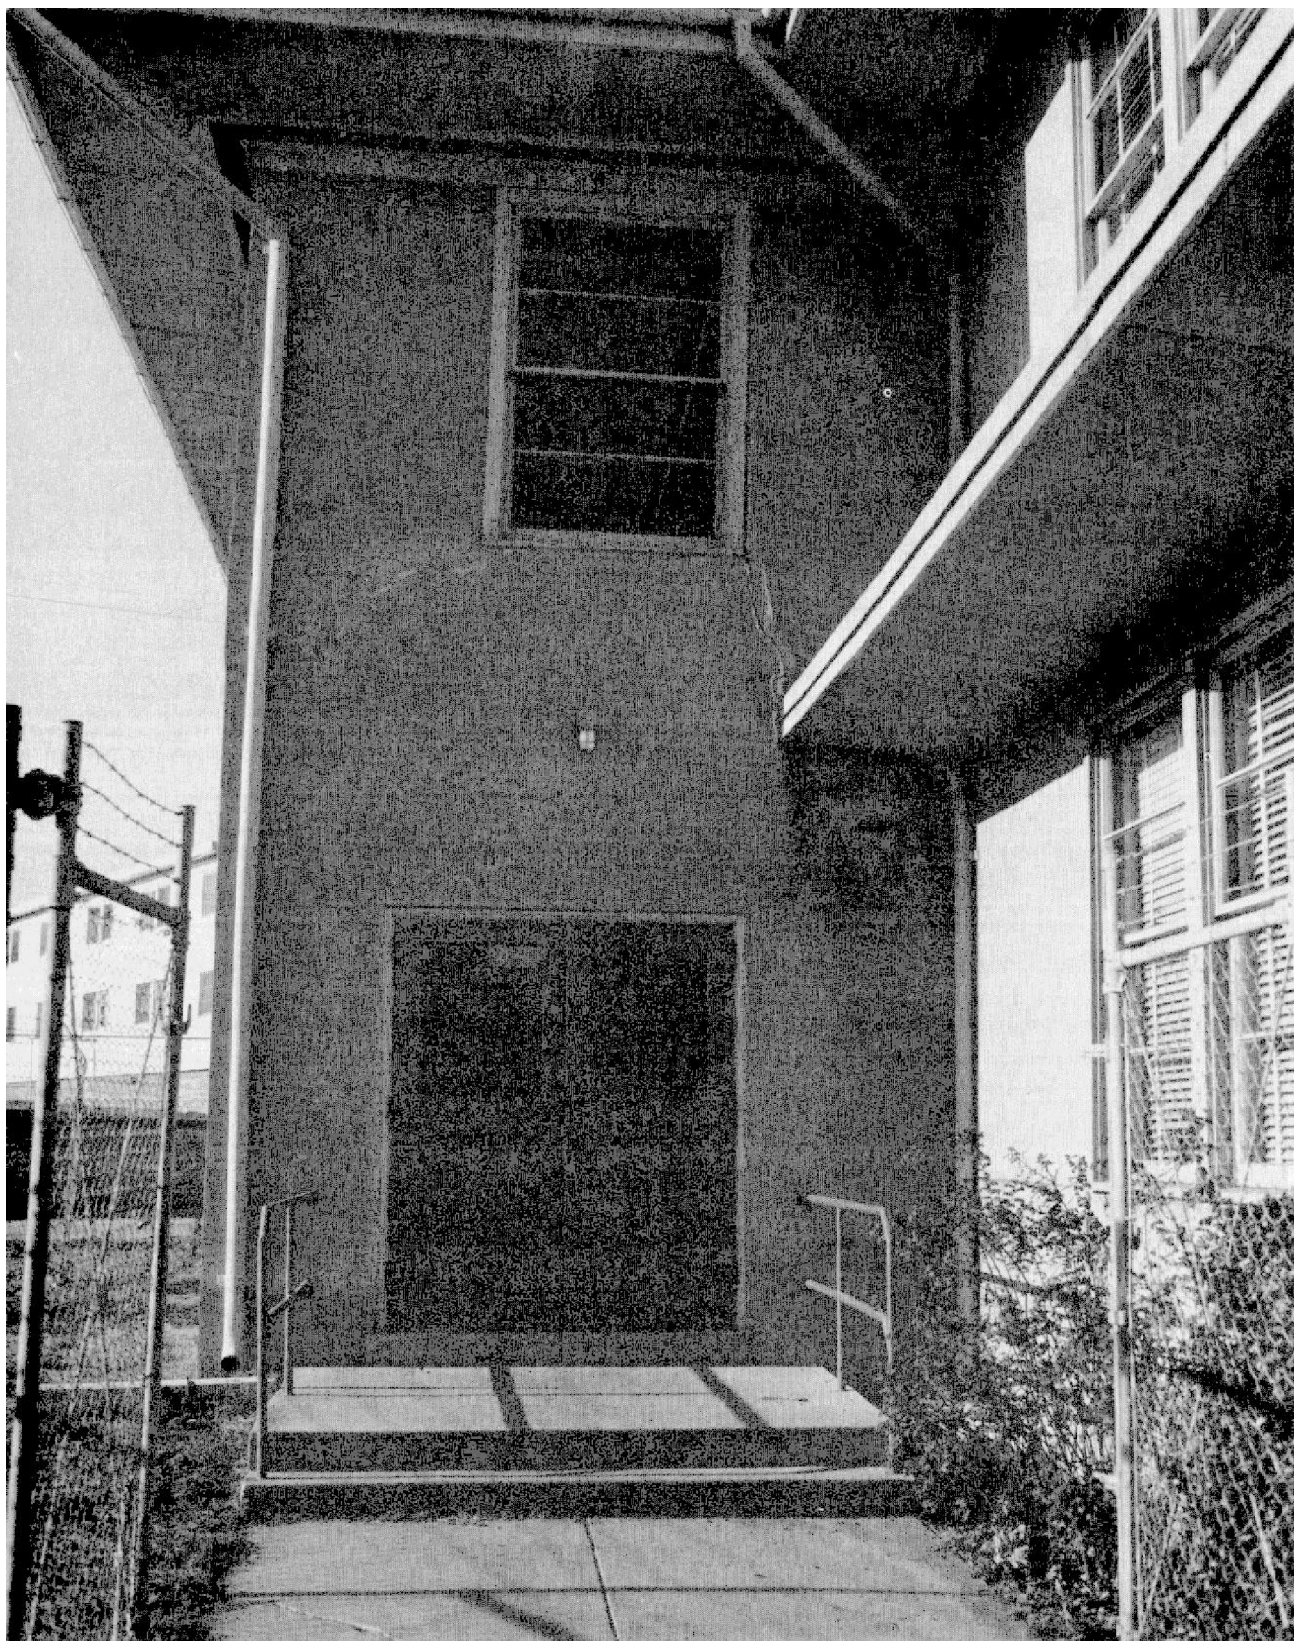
CRACKS CAUSED BY FOUNDATION SETTLEMENT—EXTERIOR.
